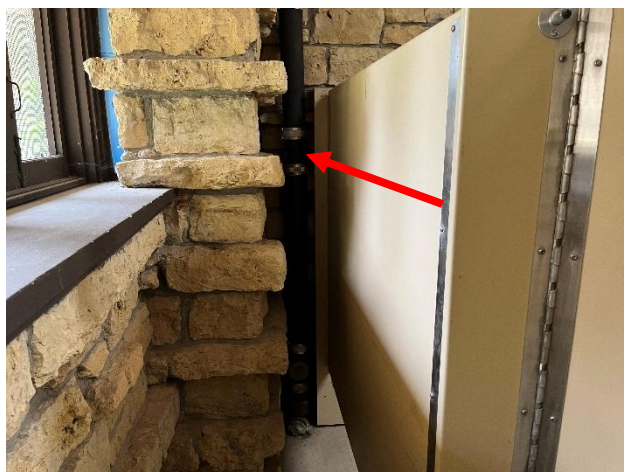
Vent pipe at the restroom extends through the floor slab and through the roof framing.
